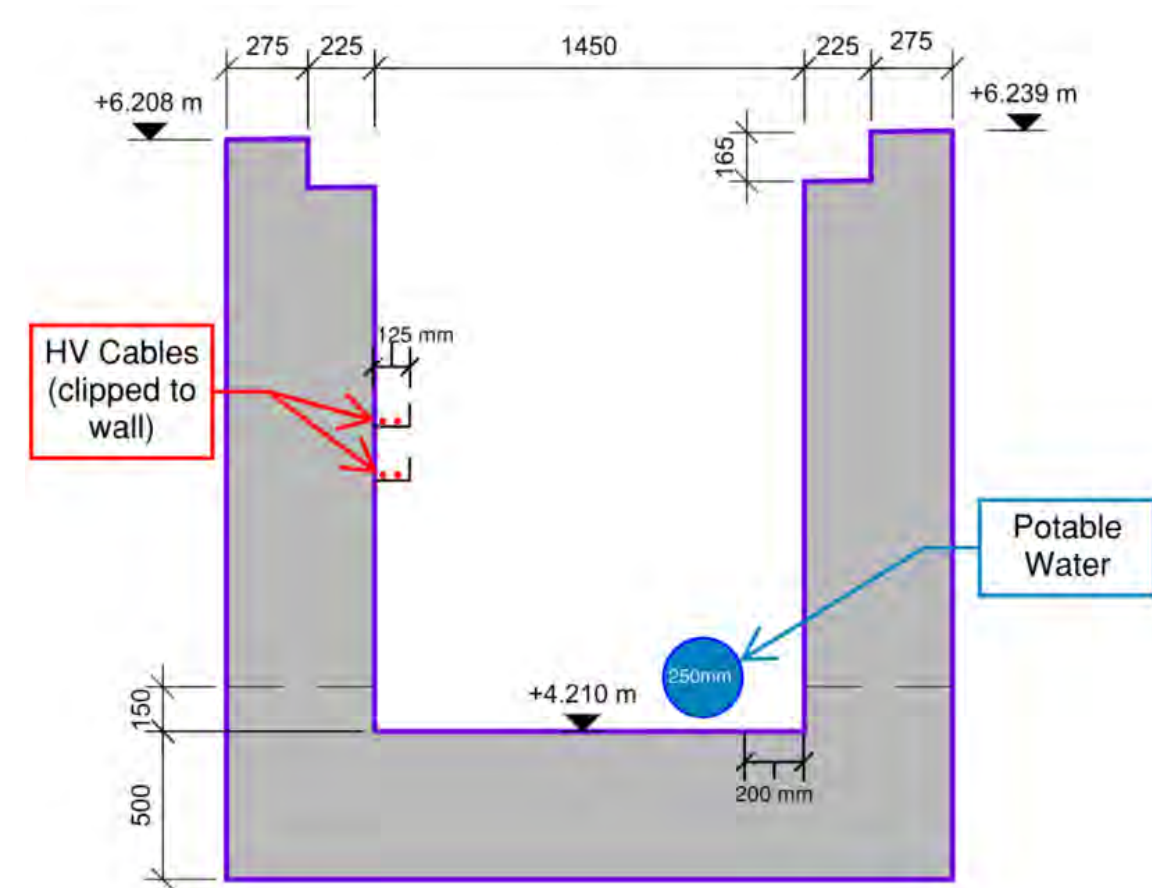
24 Indicative cable arrangement within existing trenches based on typical details shared by PoA
